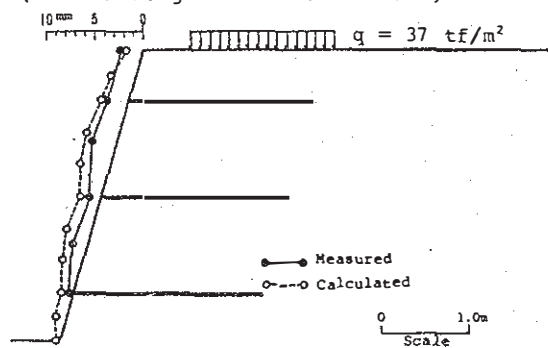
Deflection of Slope Surface (reinforcing members L = 2.0 m)
